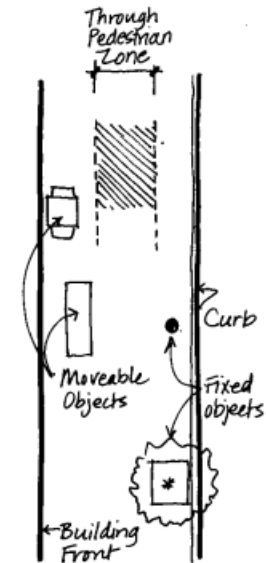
13 Typical pedestrian zone on sidewalk corridor
